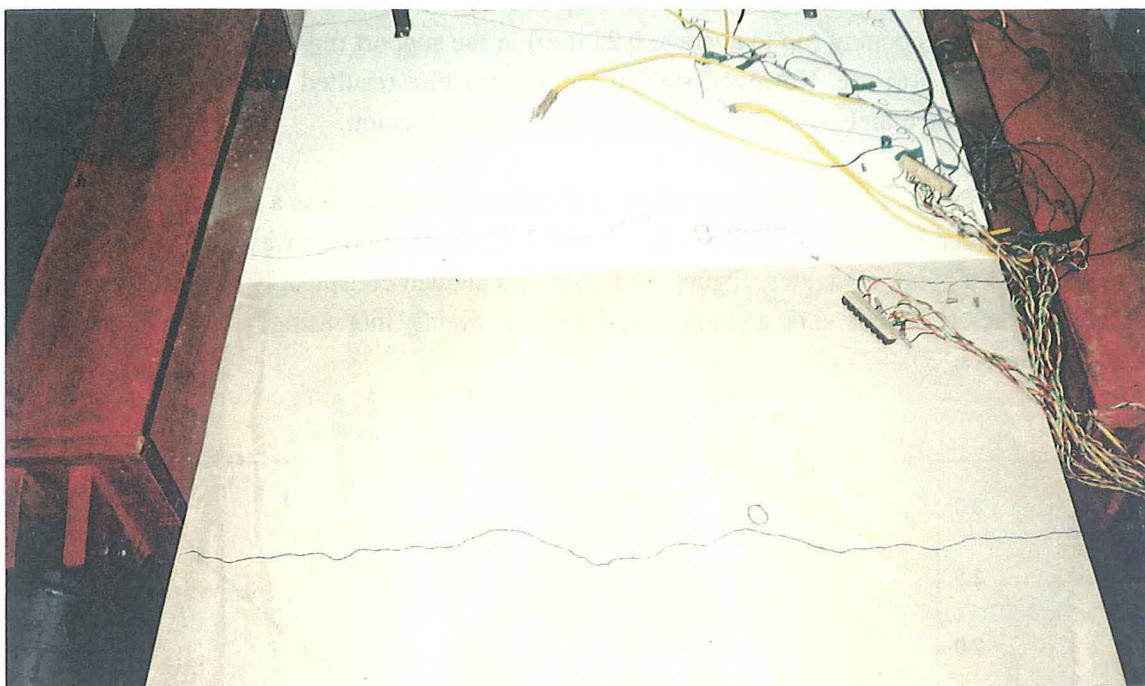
Drying shrinkage cracks in topping slab immediately prior to testing. Under applied axial force, a shrinkage crack (indicated) developed into the principal topping fracture
